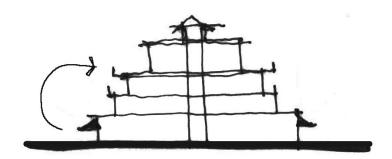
Step back buildings that exceed the height of surrounding buildings.
